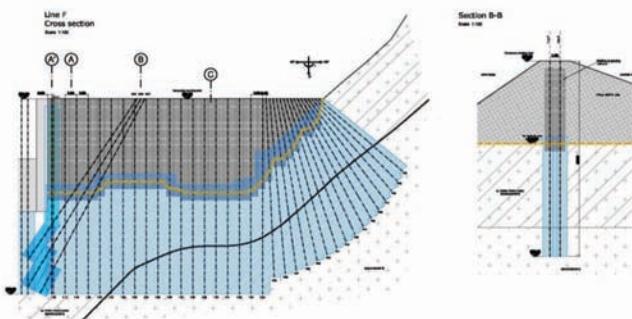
Cross sections of the treatment for the impervious curtain along the earth dam.
